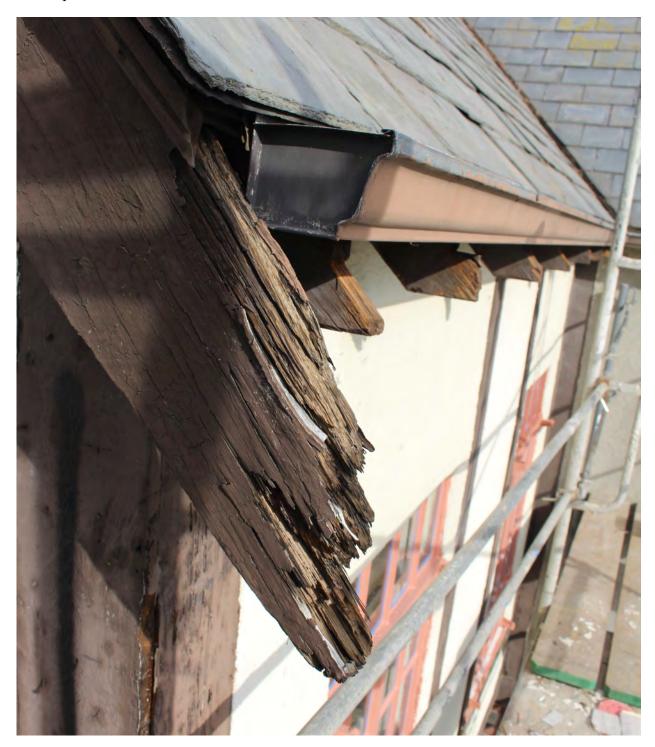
Exposed architectural wood elements suffering from deterioration, 2017. Photo credit: Stuart Gulland
